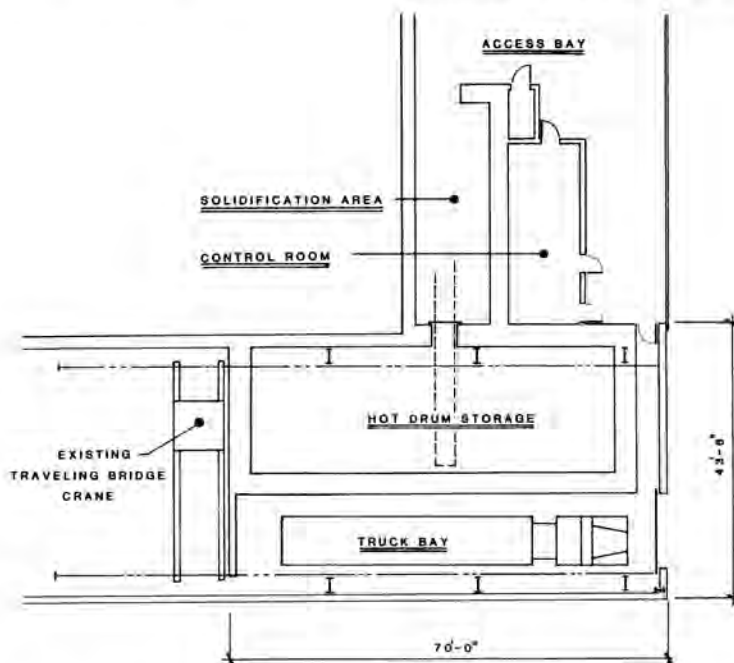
Existing Drummed Waste Storage Area at Decontamination/Radwaste Building.
